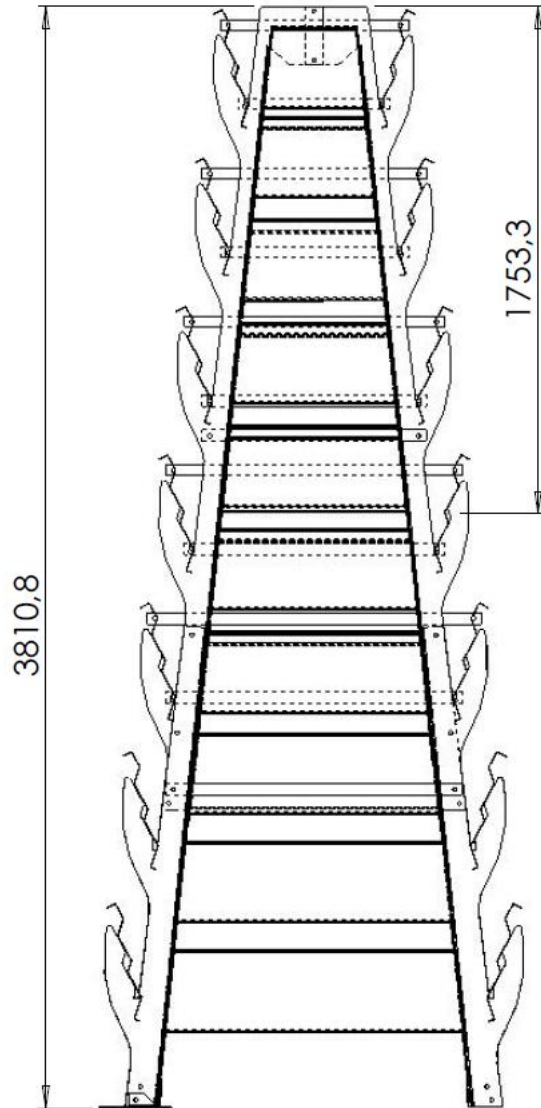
Noise barrier wall system Naturawall[®]: wall section.
